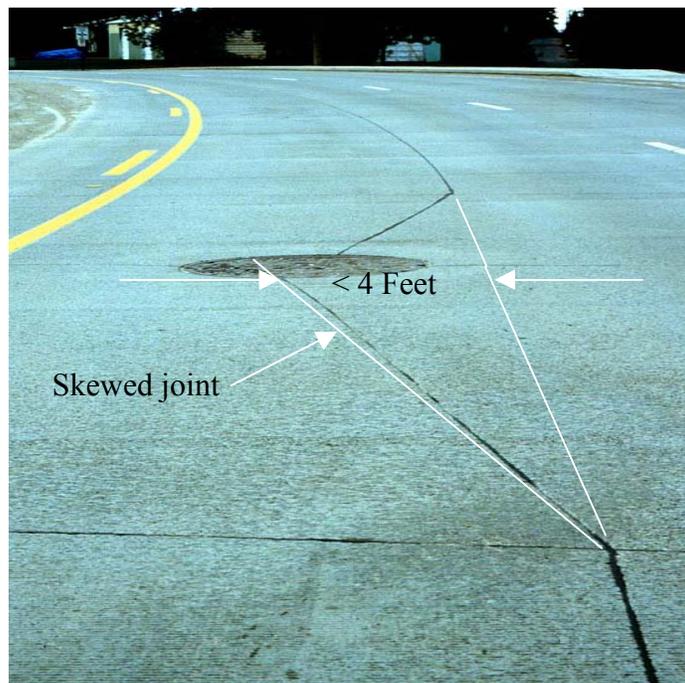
Skewed joint to a manhole along a longitudinal joint. Joints can also be skewed along transverse joints (Farwell Road, Spokane County, Washington).
